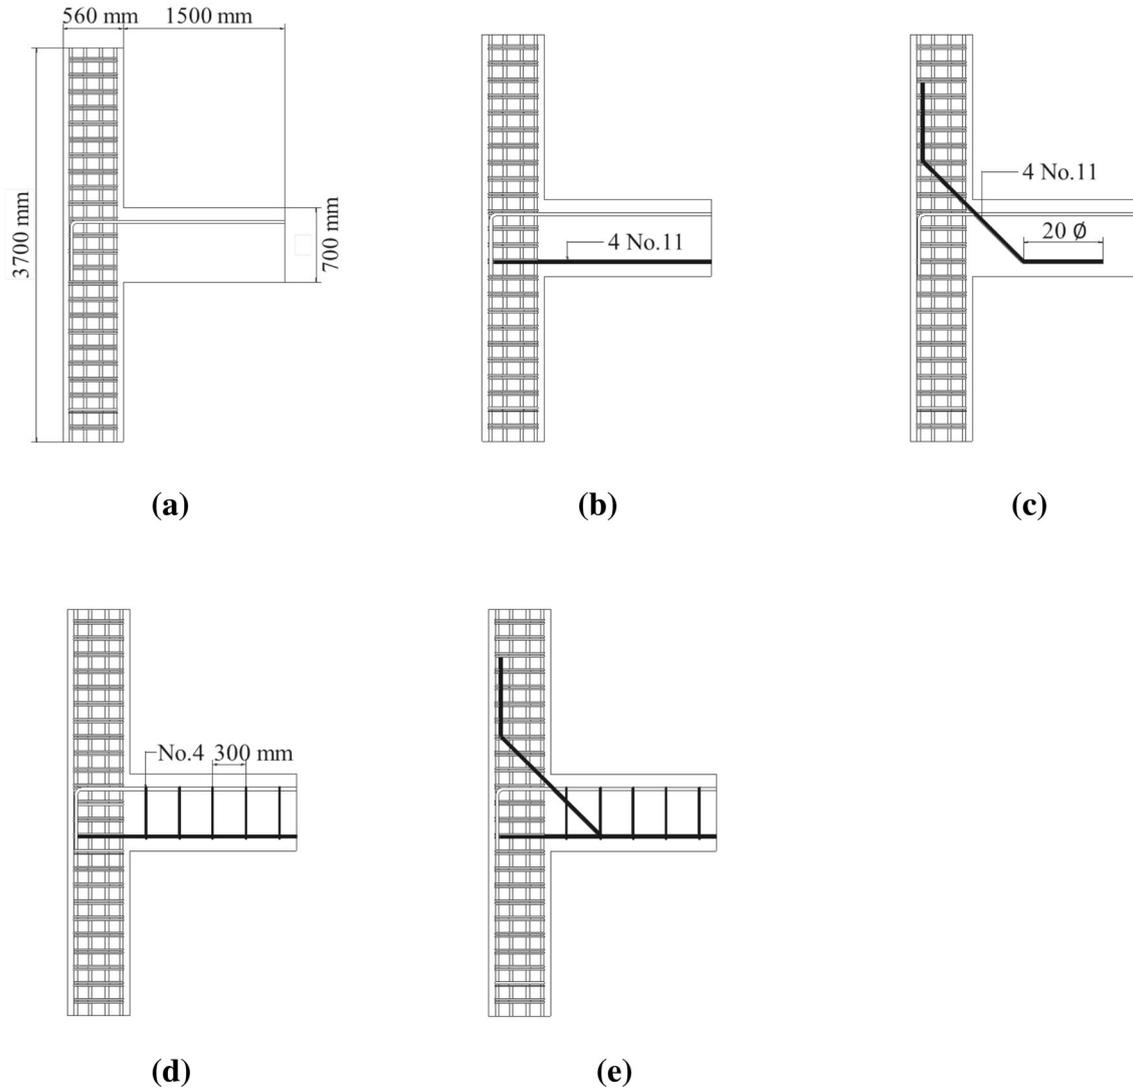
Details of specimens. a Specimen BC. b Specimen BC-F. c Specimen BC-D. d Specimen BC-F-S. e Specimen BC-A.
